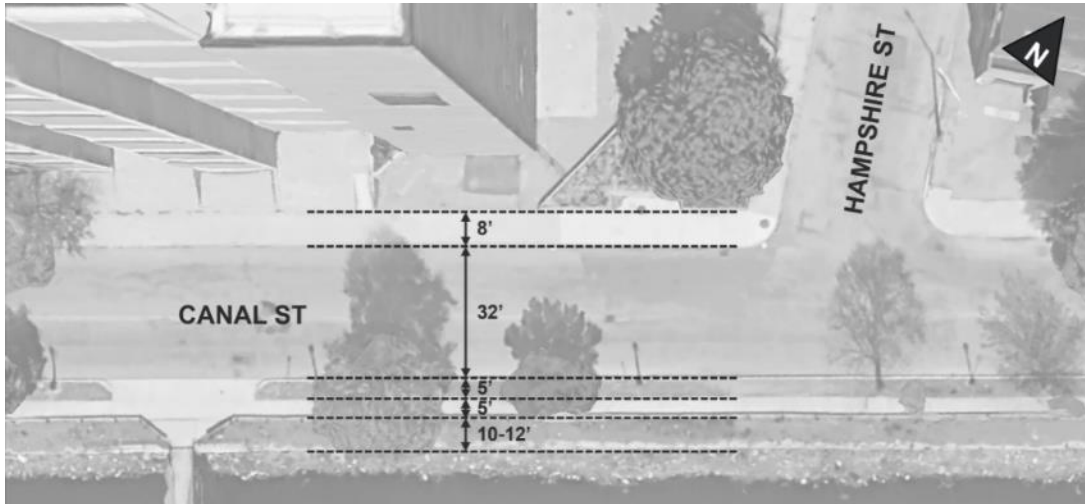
Approximate Segment 1 cross section on Canal Street near Hampshire Street
